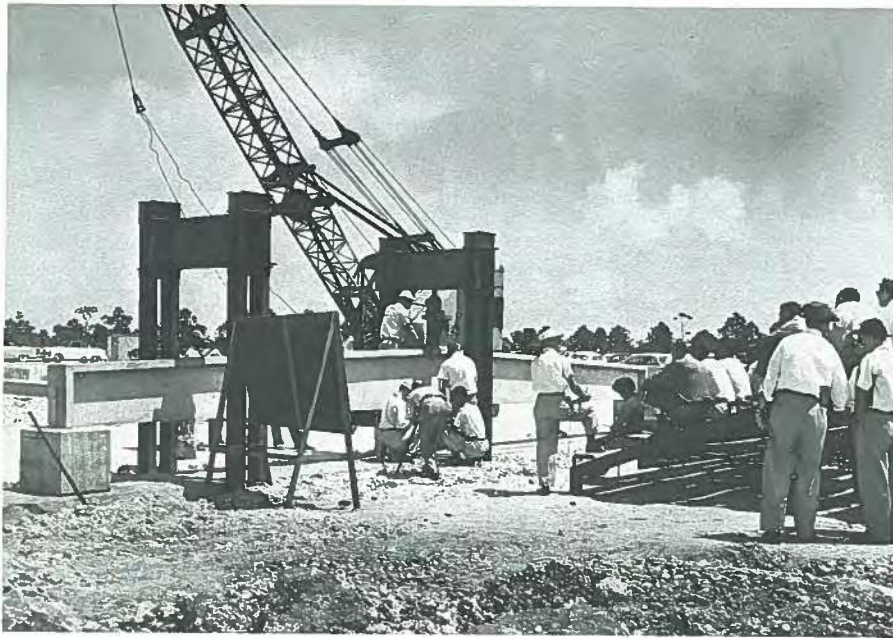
Demonstration test of variable section tee-joint at Cone Brothers Construction Co., Tampa, Florida. Courtesy: Paul Zia.
